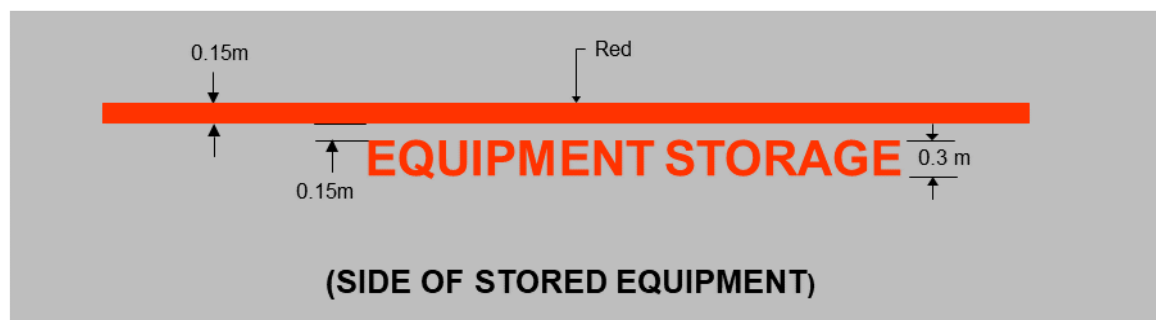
(4) Equipment storage and apron road marking (illustrates matters)
